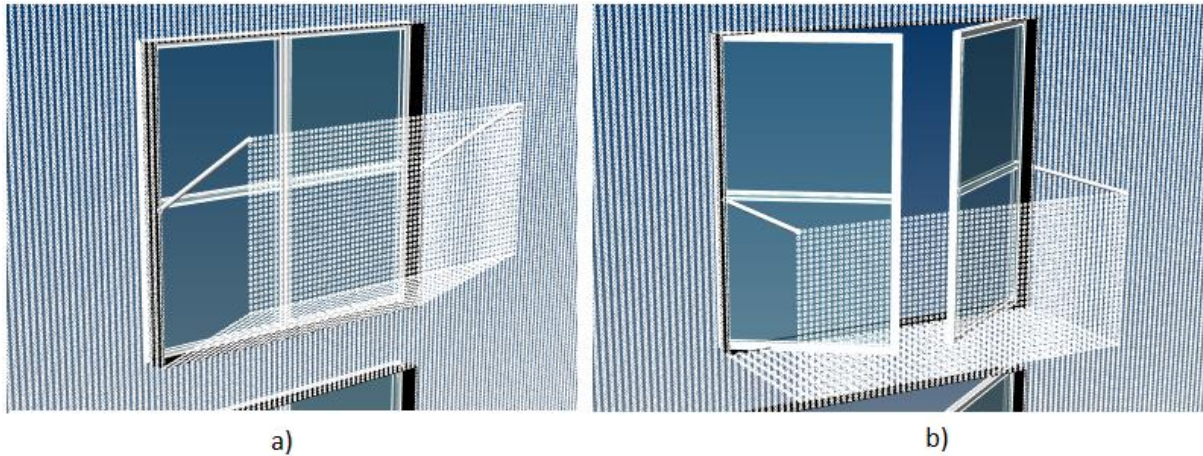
Transformation principle: a) unfolding screen, b) opening windows
